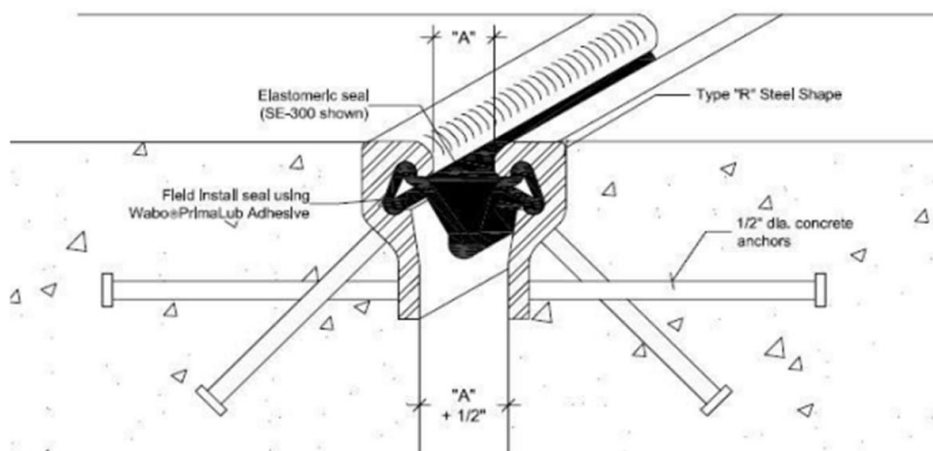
Strip Seal Joint (SSJ) with steel edge beam and elastomer strip
